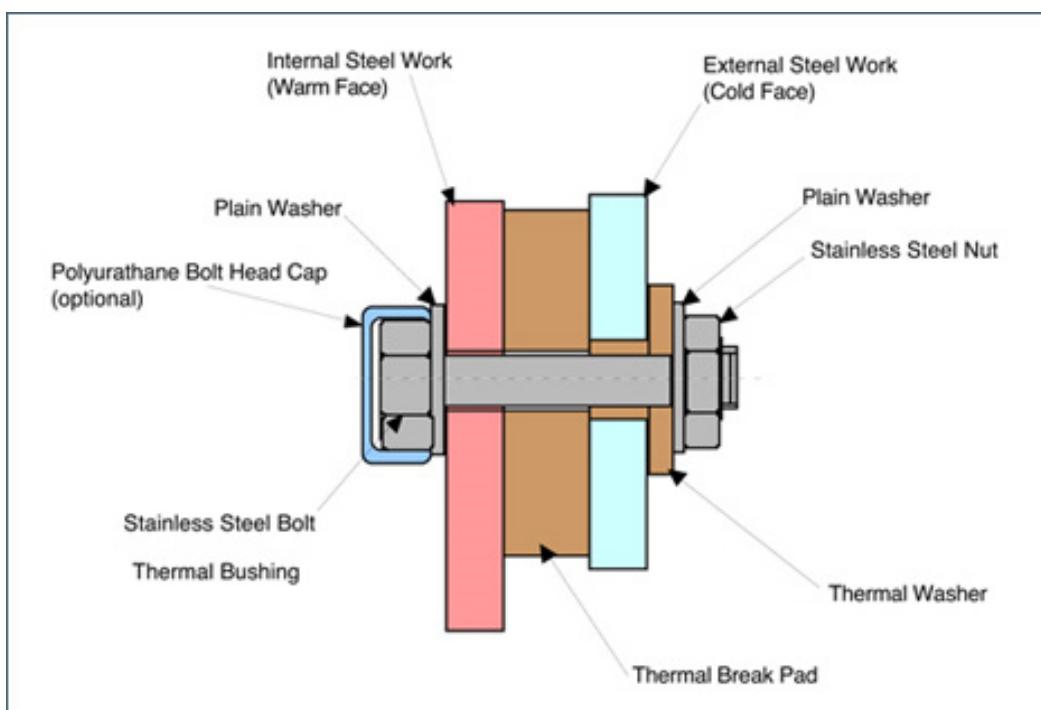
Armadillo thermal break plate connection detail steelwork
